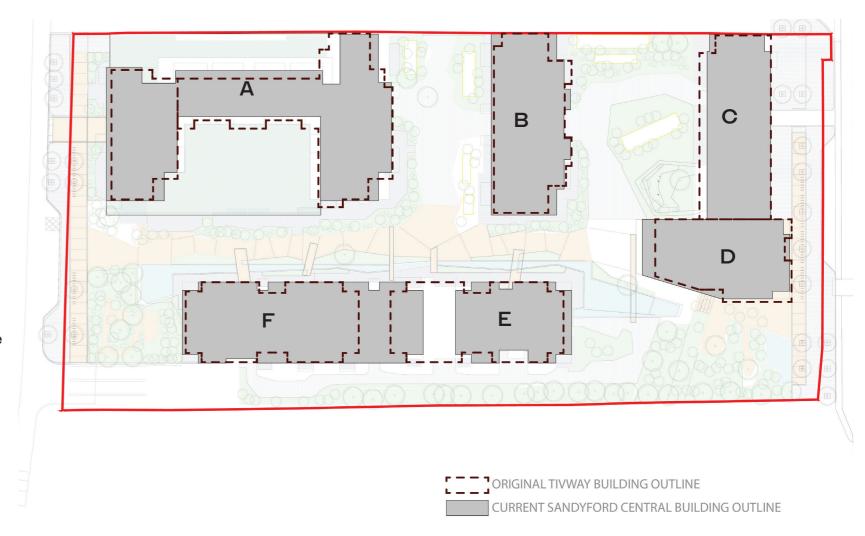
Site plan - overlay of proposed Sandyford Central outline on the permitted Tivway scheme
